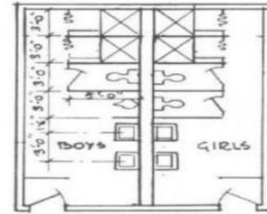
Typical toilet layout. Note back-to-back placement of plumbing fixtures for economy; common plumbing wall for ease of plumbing access; water closets separate from toilet area for better usage; water closets in separate compartment for privacy; screen at entrance door to shield interior.
